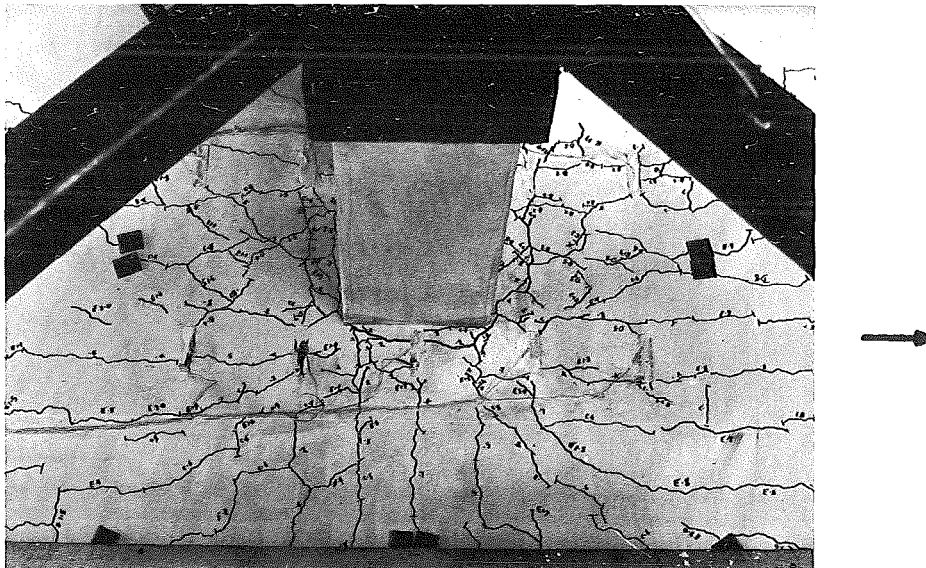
CRACK PATTERN OF SPECIMEN 3C
